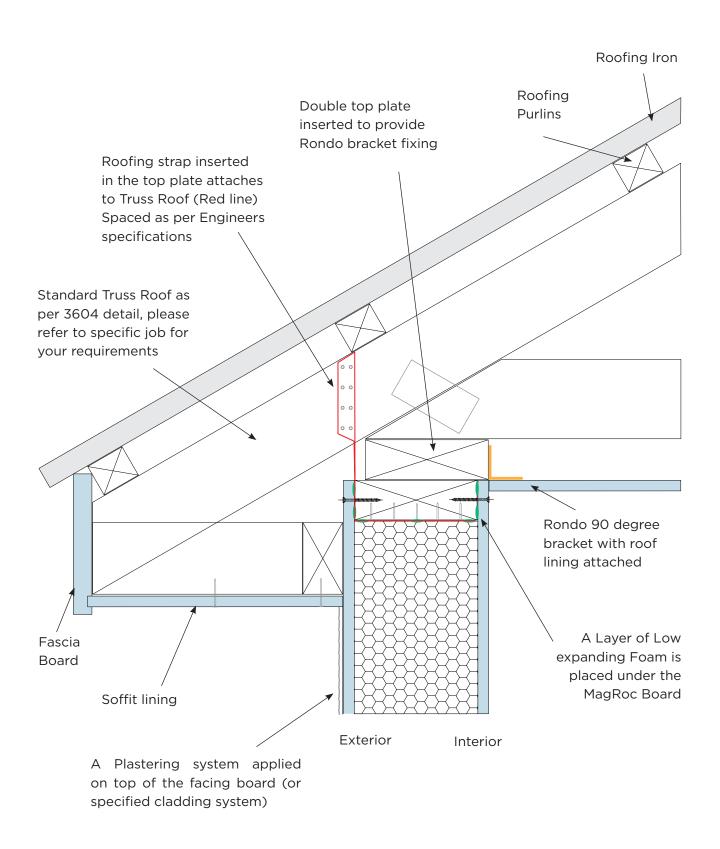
MagRoc 'Typical' WarmRoof with Truss Roof & Square Soffit
